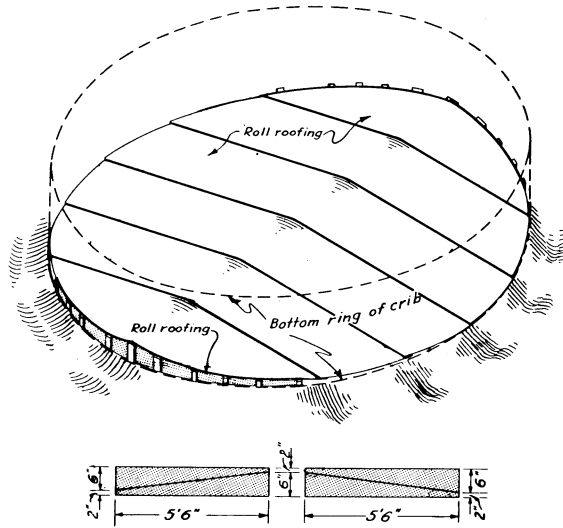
Plan for making ridged fill, roll roofing floor for snow fence or wire mesh corn crib.
